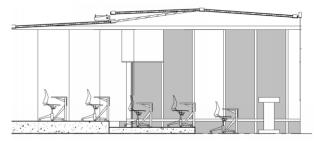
| Transverse Section Multipurpose Room Sloped Wood Ceiling
